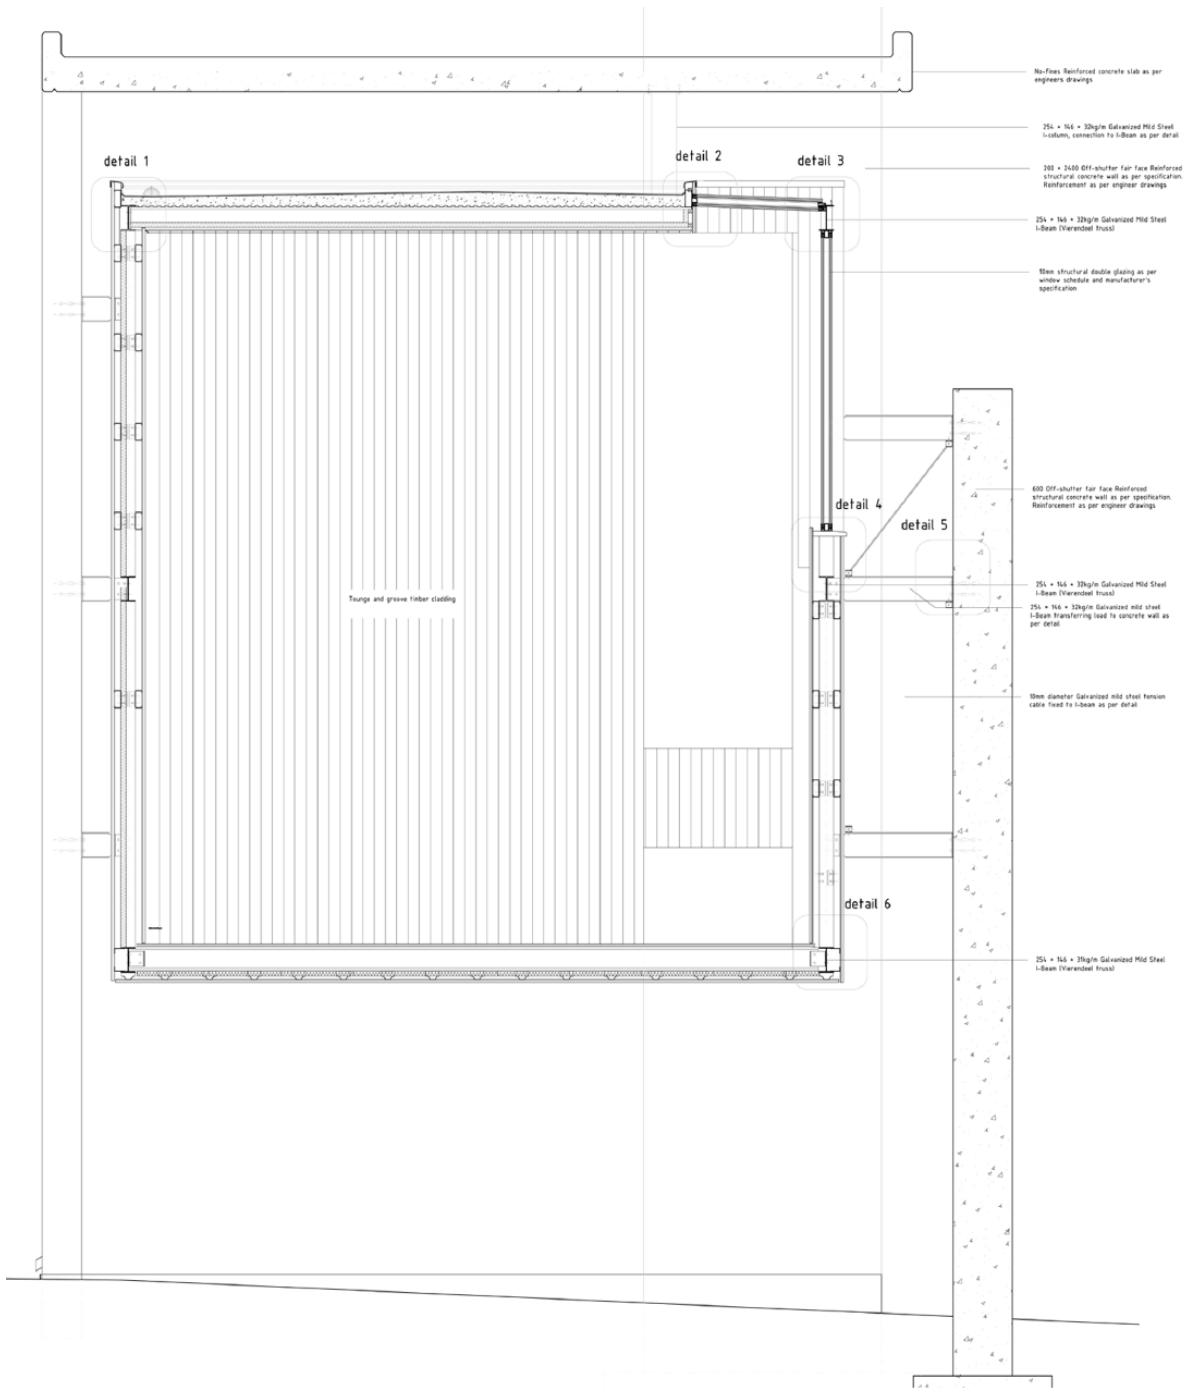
Secondary structure load tracing digital rendering indicating connection between vierendeel truss and lipped channels onto which the timber founge and groove boards are fastened.
